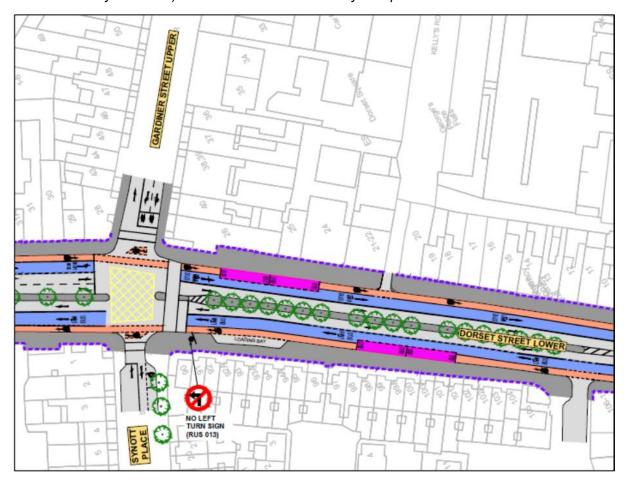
Gardiner Street Upper/Synott Place to Hardwicke Place/Eccles Street
